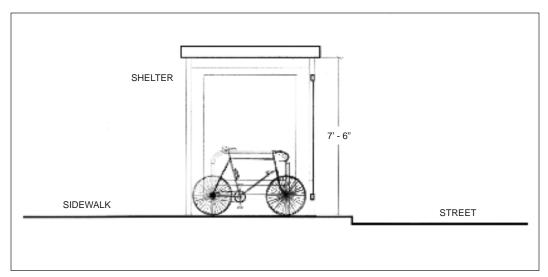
Section Through Proposed Curb Extension with Sheltered Bicycle Parking
